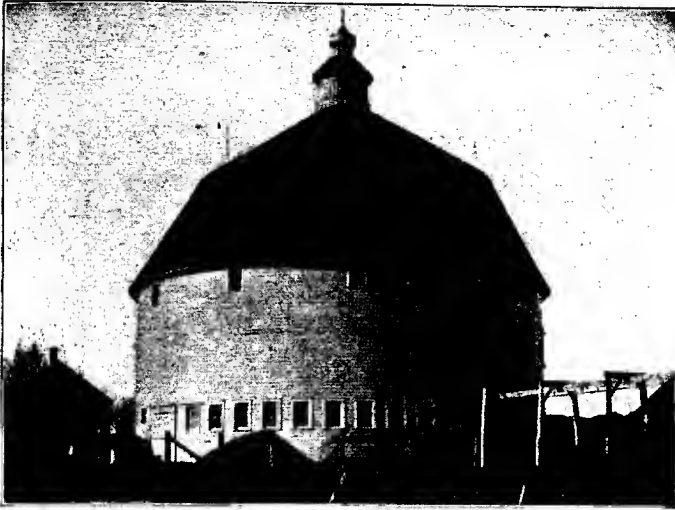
A DAIRY BARN SIXTY-FOUR FEET IN DIAMETER, WITH DRIVEWAY TO THE SECOND FLOOR
